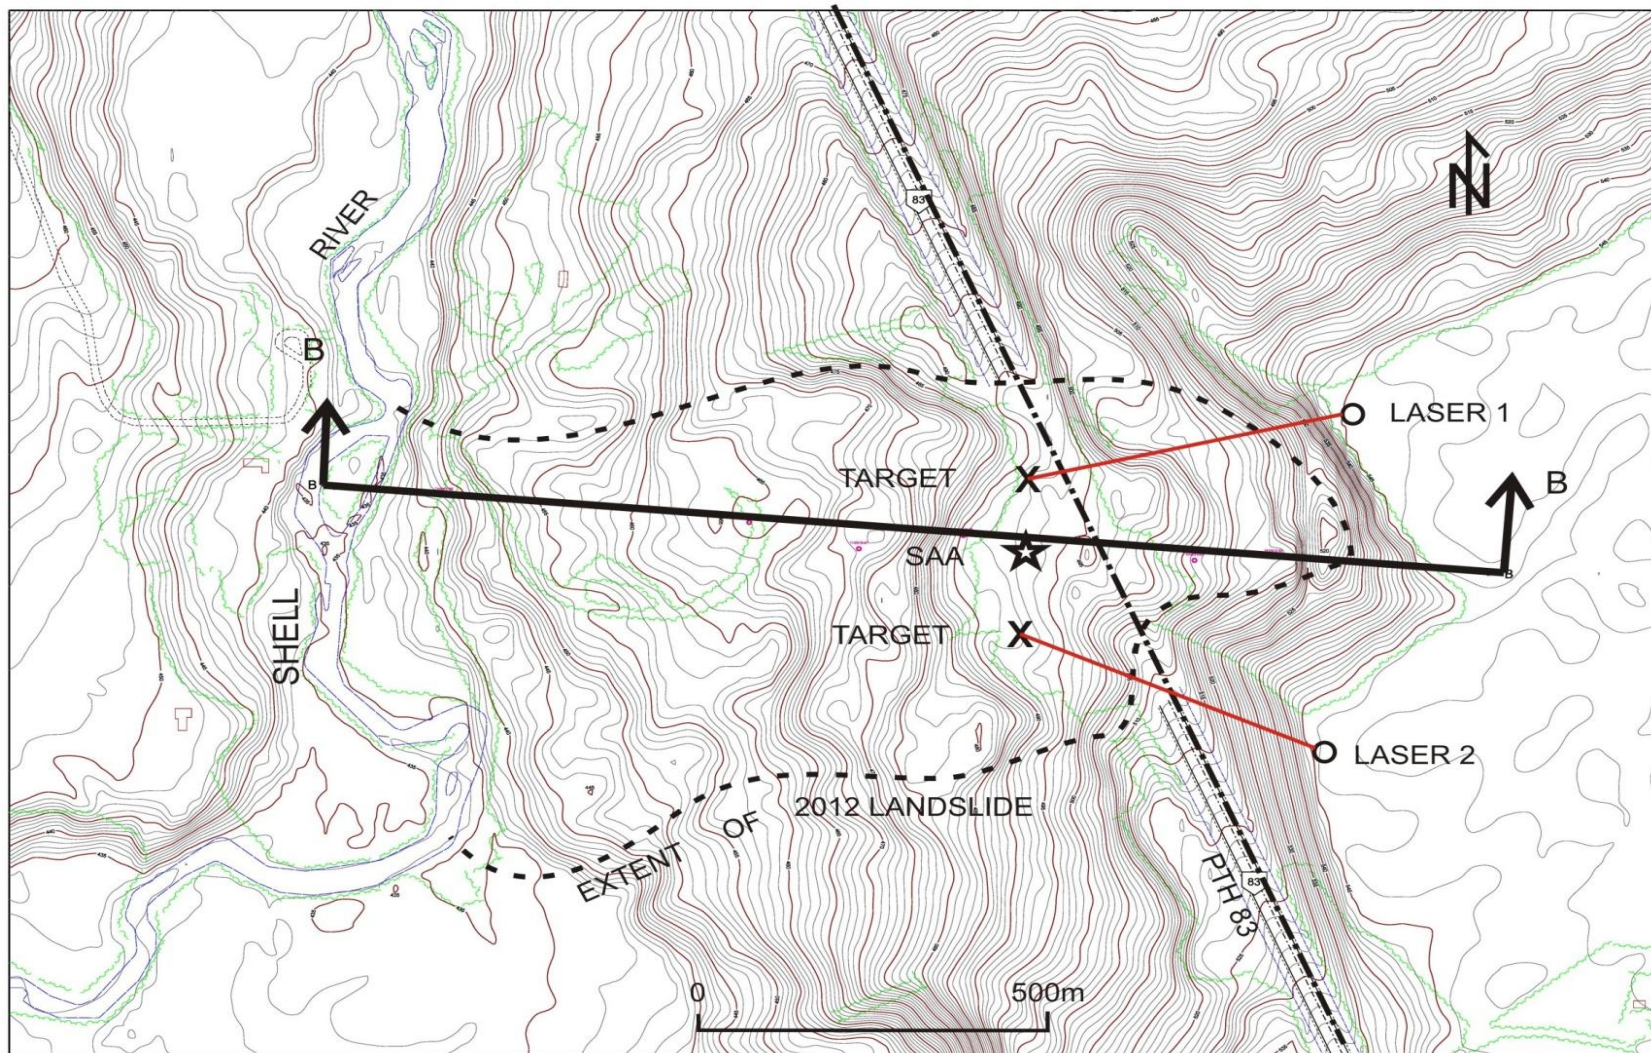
PTH 83 Shell River Landslide Site Plan - Showing locations of remote monitoring equipment
